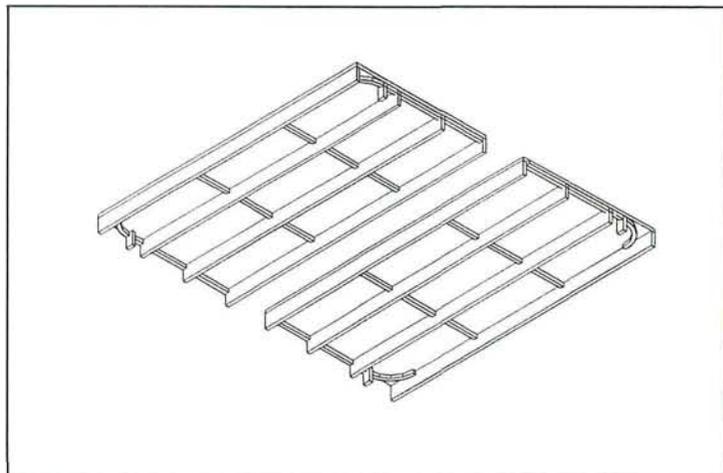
Underside of stage floor decking - 3.5 foot x 7 feet decks.
